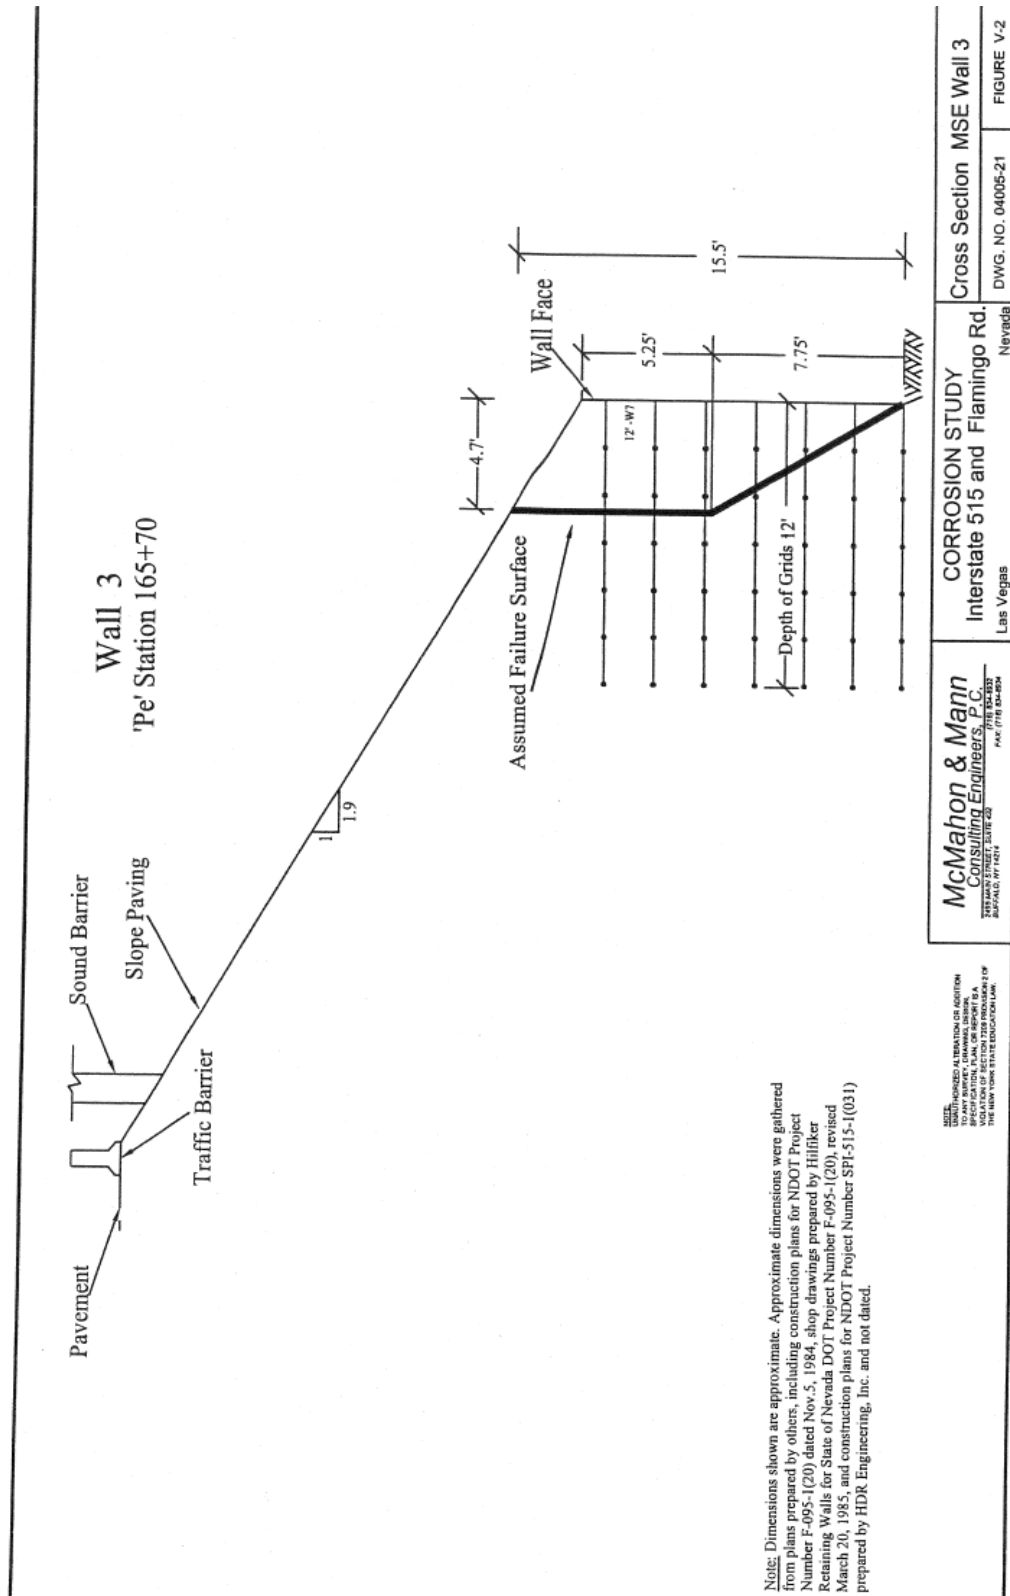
Flamingo Wall #3 Analysis Section (Fishman 2005)
